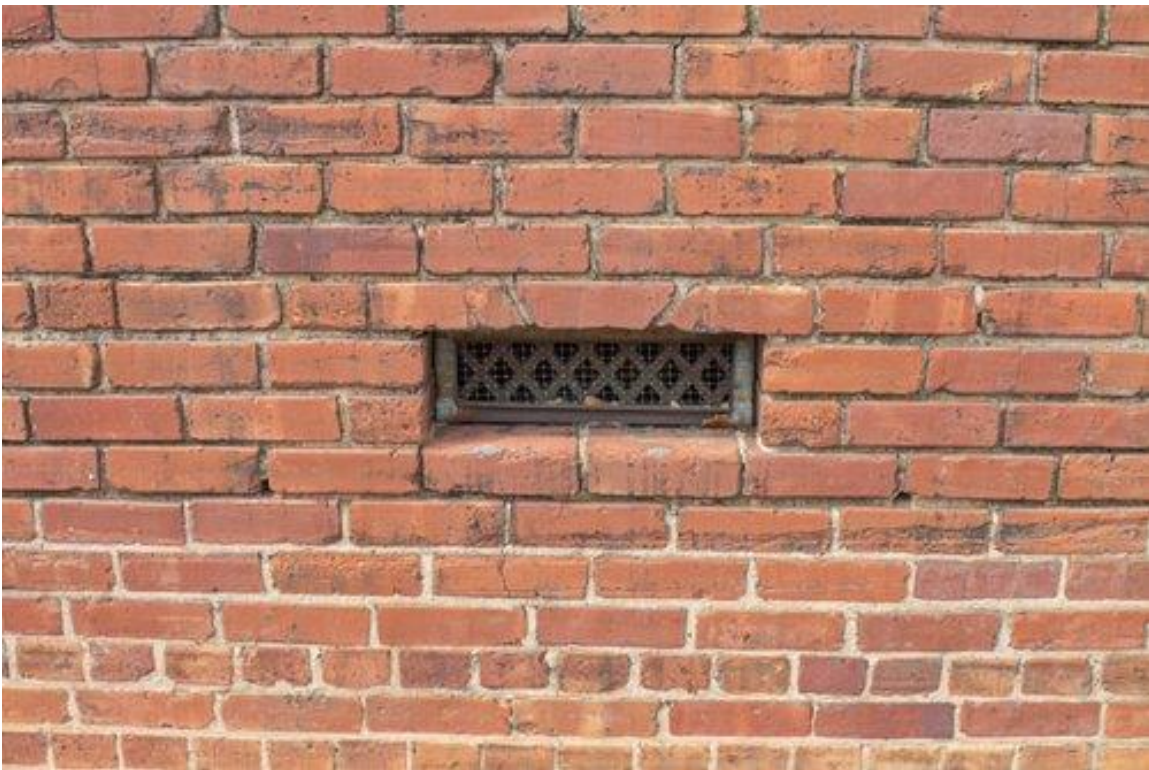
South elevation detail. Note previous repointing and configuration of original steel foundation vent. Note chevron articulation of brick row about vent and common bond masonry pattern at foundation level featuring no differentiation between headers and stretchers.
